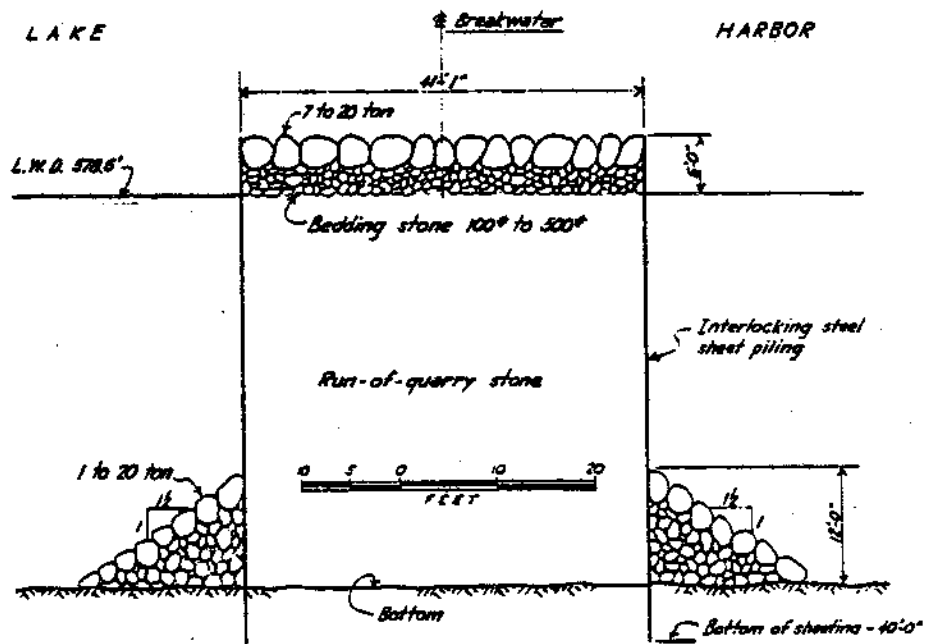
Cross-Section through Cellular Sheet Pile Breakwater at Calumet on Lake Michigan (Quinn, 1972, p. 252)
